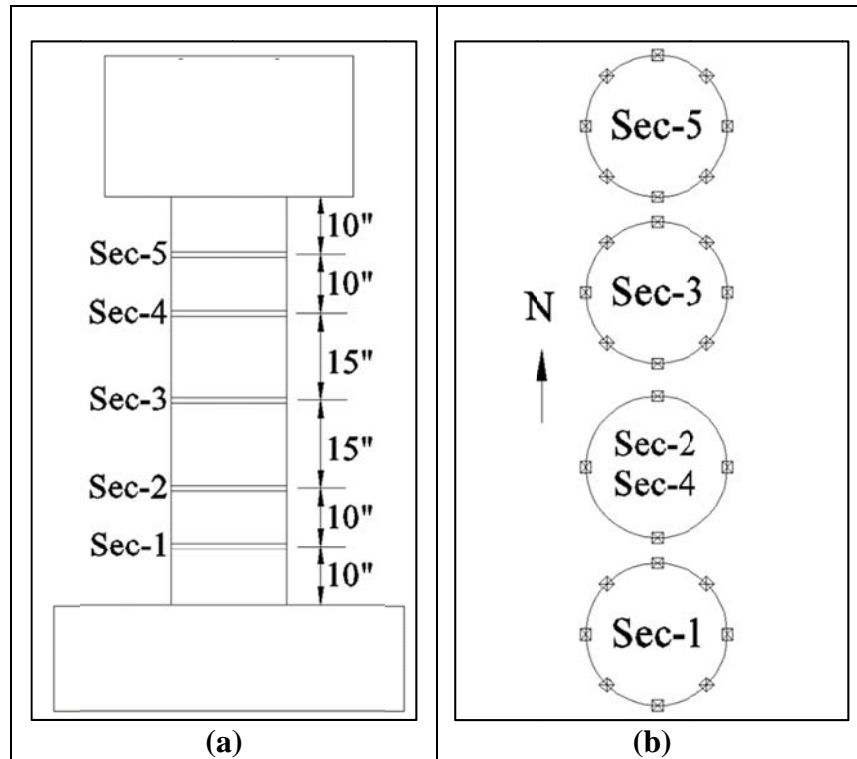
Strain gauges installed on the FRP jackets: (a) elevation view; (b) section details.
